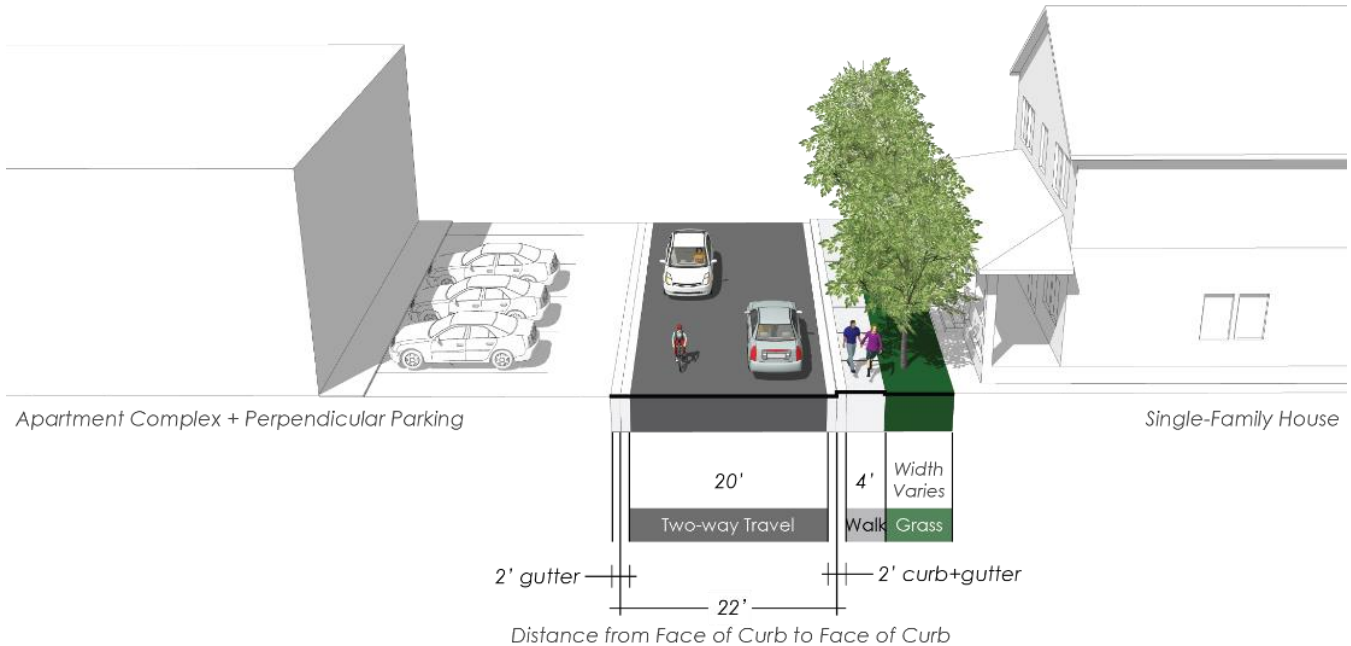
shows the existing cross-section of Tilbury Street from Cheltenham Drive to Chase Avenue. Tilbury Street is a two-way street, north of Cheltenham Drive, and includes a sidewalk on the east side of the street. No on-street parking is allowed, however, there is residential perpendicular, off-street parking on the west side of the street.
